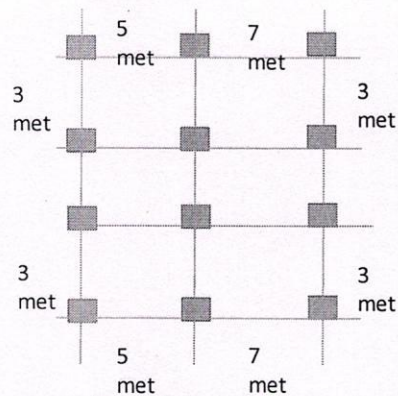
Field layout plan, Field Levelling and grading after initial location
